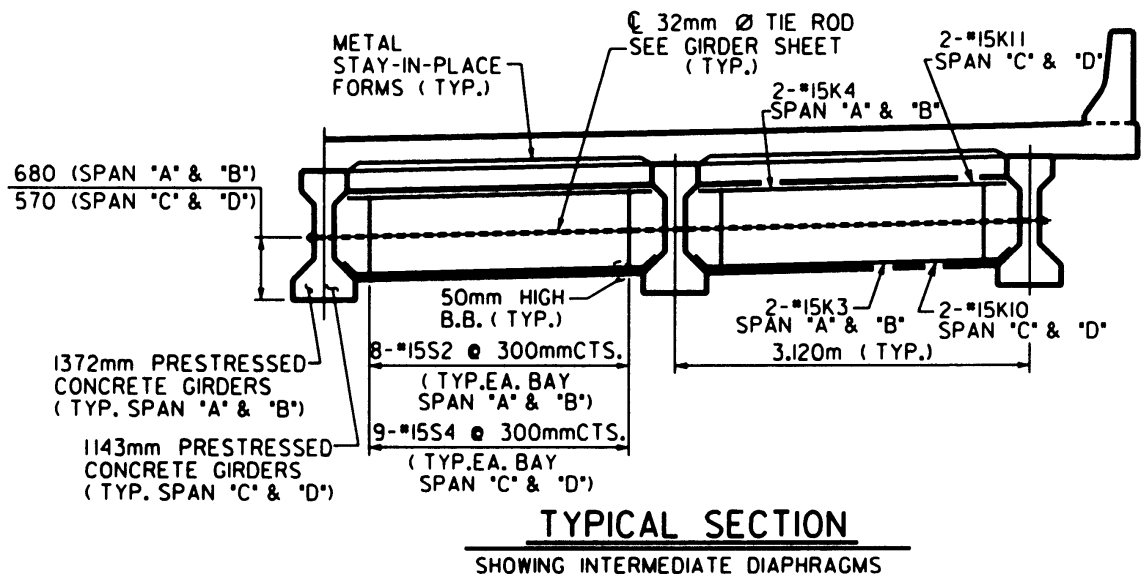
Northbound Bridge Superstructure Looking Southwest
